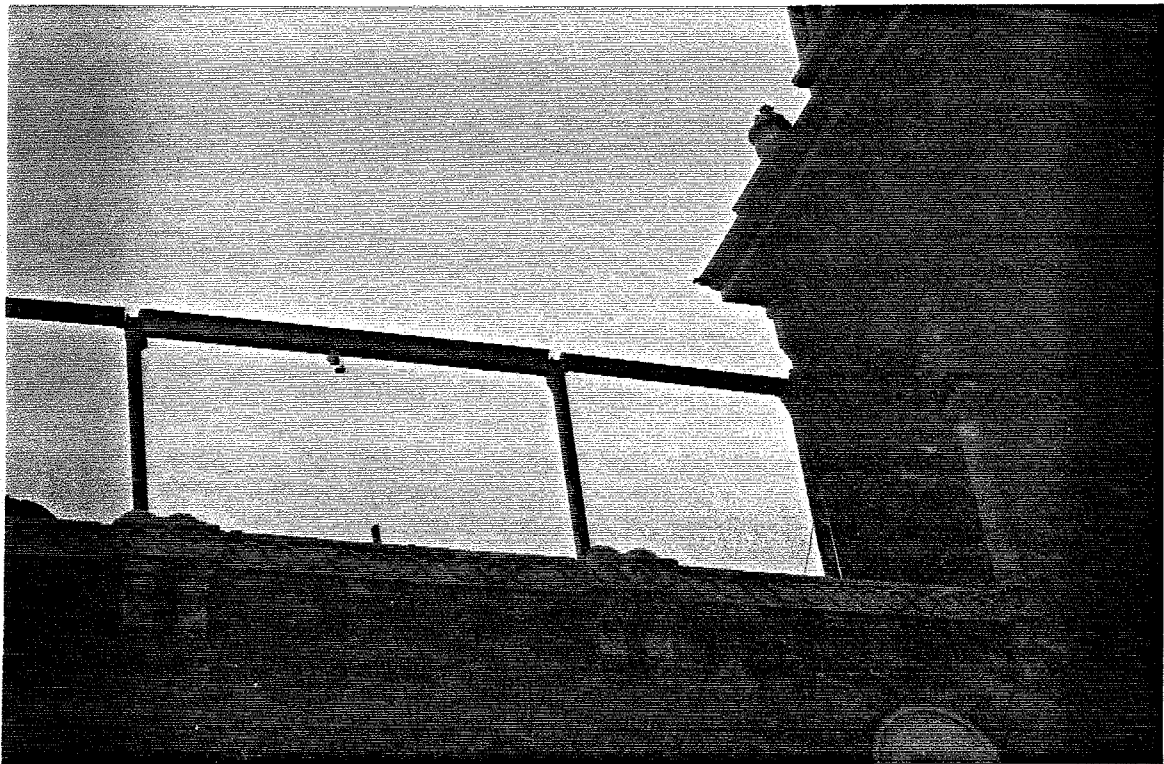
Close-up view of steel frame that supported masonry wall.
